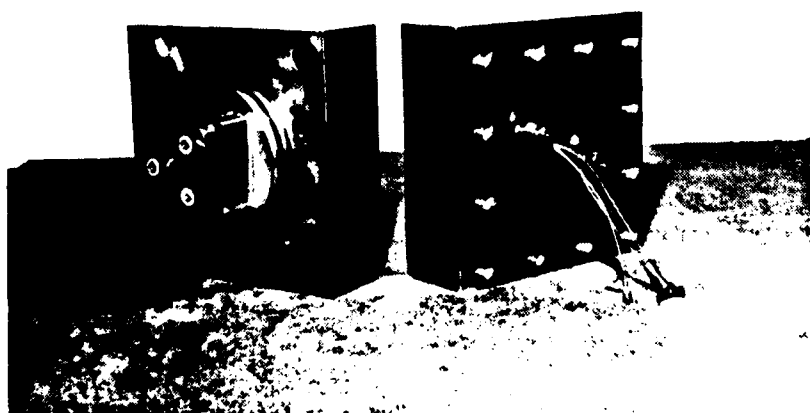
Front and Rear View of a Typical Assembled Wall.
